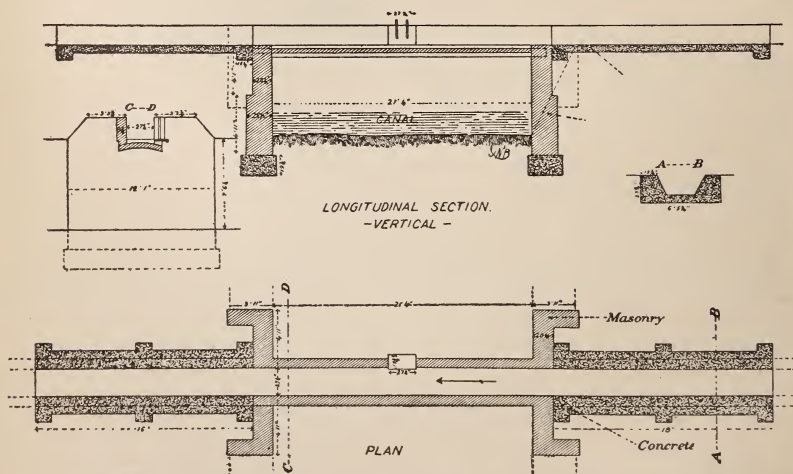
Iron, masonry, and concrete crossing of a lateral over a canal.
